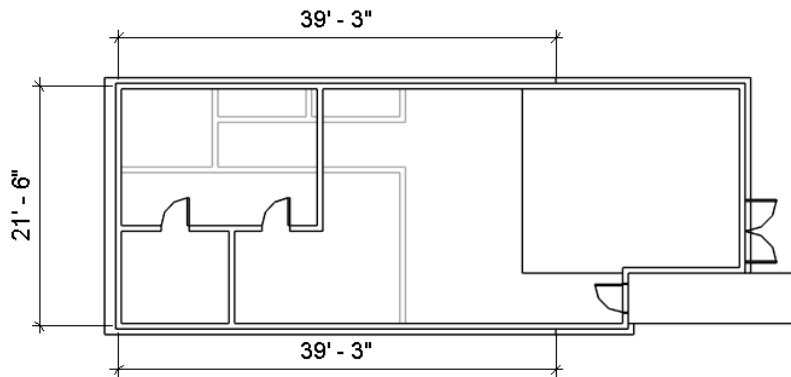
The Upper Interiors doors access these two rooms, you can see the door connecting the Medium Size Bedroom and Everything Else is interior because it's facing into the wall you're attaching it to. The closet door is exterior because it's facing away from the main room it's connecting. In an effort to stay away from pedantry, it's best to look at the following figure and then reference the guide for specific details. You'll get a hang of it
